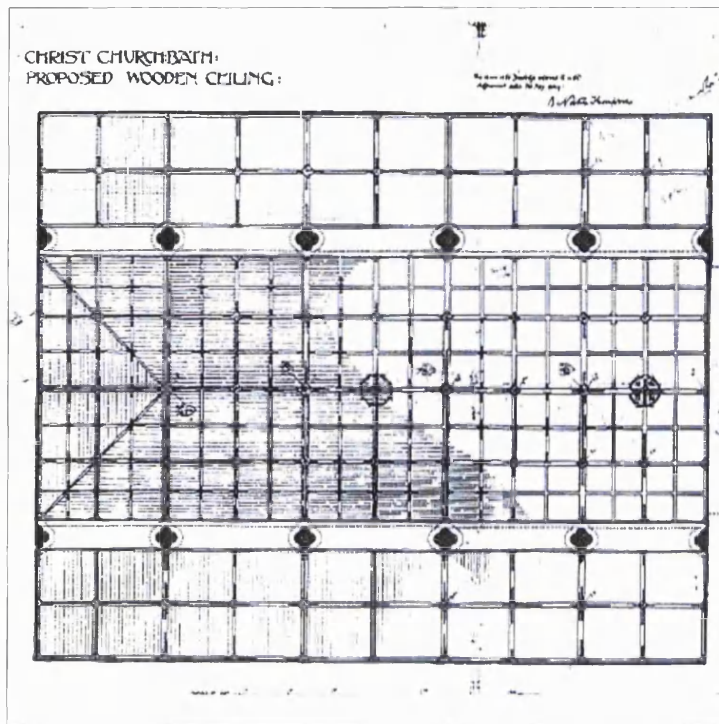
Christ Church, Julian Road. Contract drawing: layout of wooden ceiling. Signed Wallace Gill, dated February 1904.
